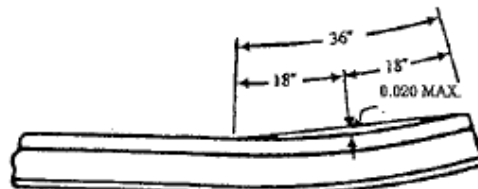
Side Elevation of Rail Uniform Upsweep Tolerance at Rail Ends
